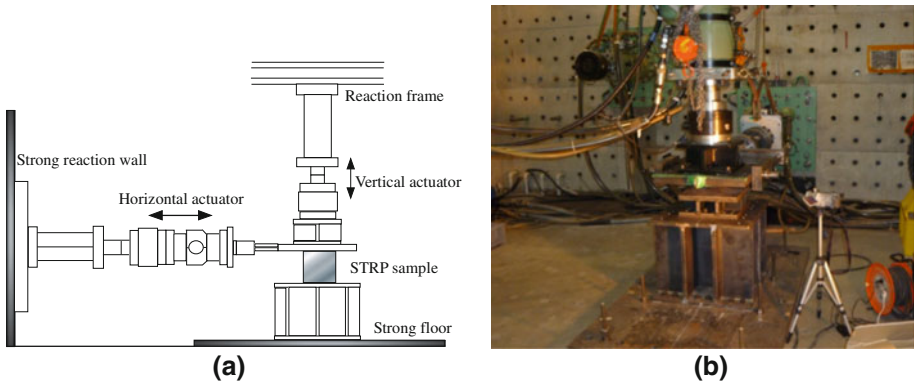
Overview of test setup and instrumentation arrangement. a Sketch, b photograph
